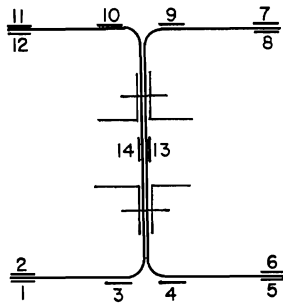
Locations of Strain Gages on the I-Shaped Stub Columns
